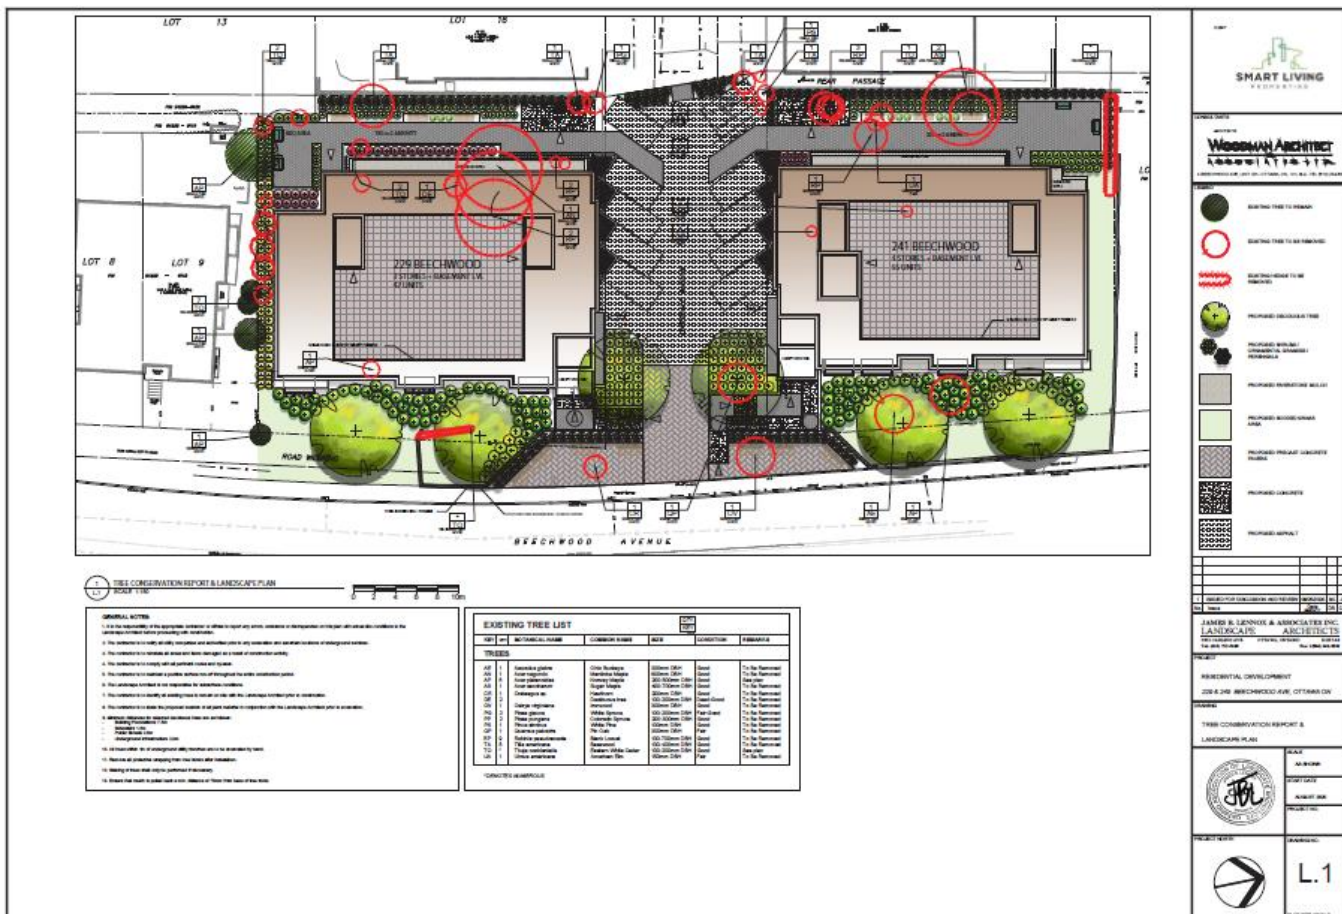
rendered landscape plan. Source James Lennox & Associates Landscape Architect. October 2020.
